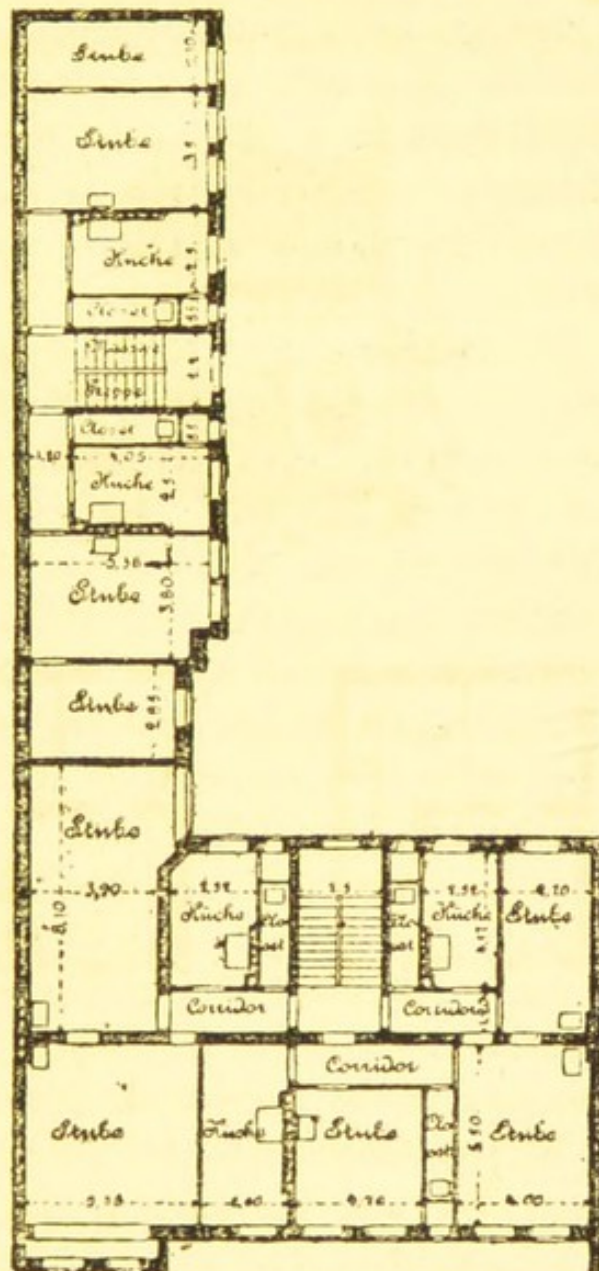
Arrangement of Rooms in the Block Building erected by the Bau und Spar Verein, Berlin.
